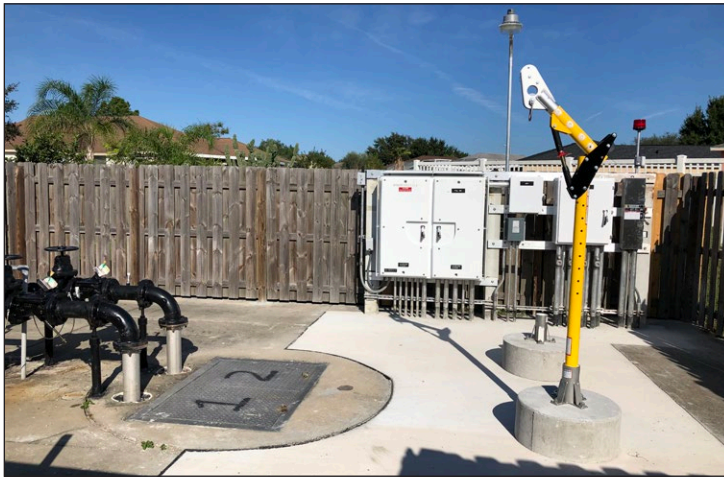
Recently installed flush-mount anchor does not block access or introduce a trip hazard.
